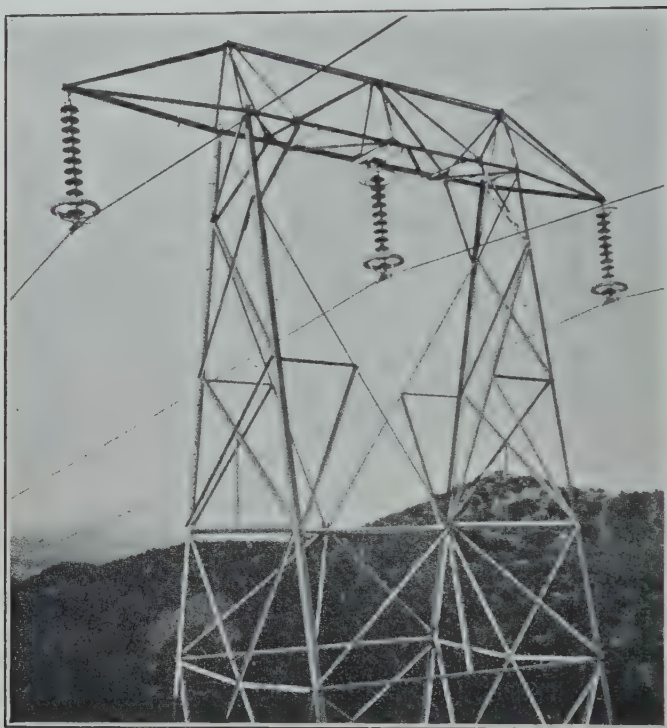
Standard single-circuit suspension tower, 220,000 volts—Southern California Edison Company. (Courtesy of Aluminum Company of America.)
